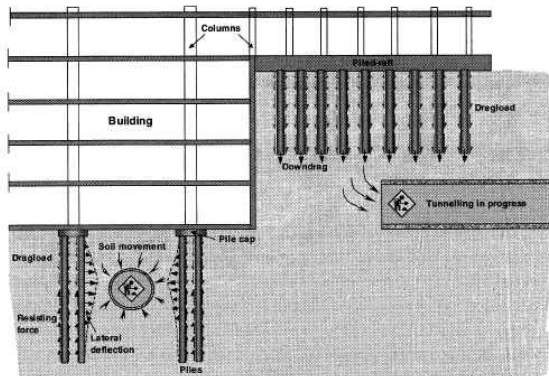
Illustration of the responses of pile foundation when subjected to tunnelling induced movement
